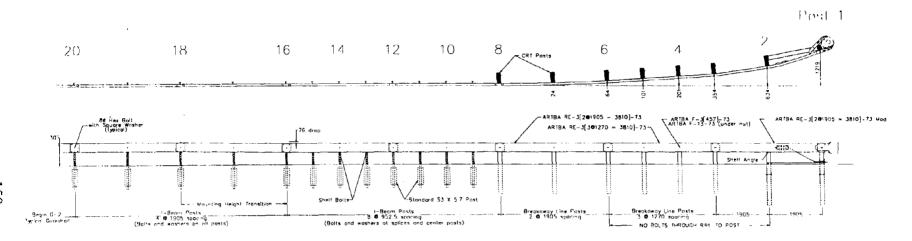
Details of the modified mini-MELT for the weak-post G2 guardrail system used for tests 471470-24 and 471470-25.
